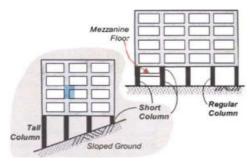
Building Frame with Long and Short Columns (Parikh & Shaligram, 2019).
